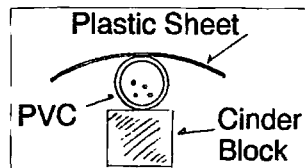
Cross-section view of the underground PVC pipe/cable raceway described in the text.
